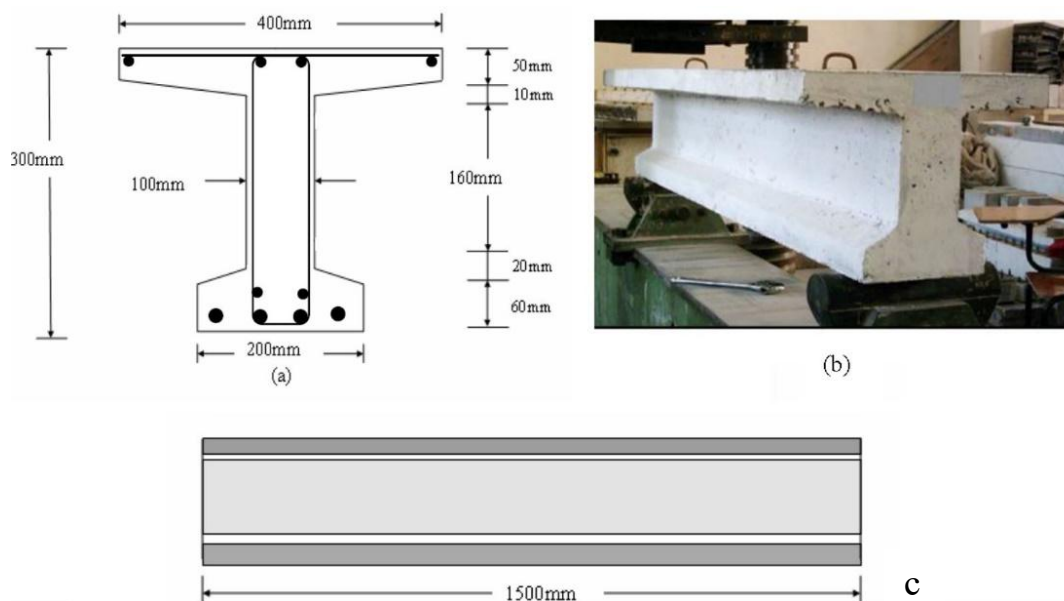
Details of Test Beams: a) Beam Cross-Section; (b) Isometric View; and (c) Side View [27]
